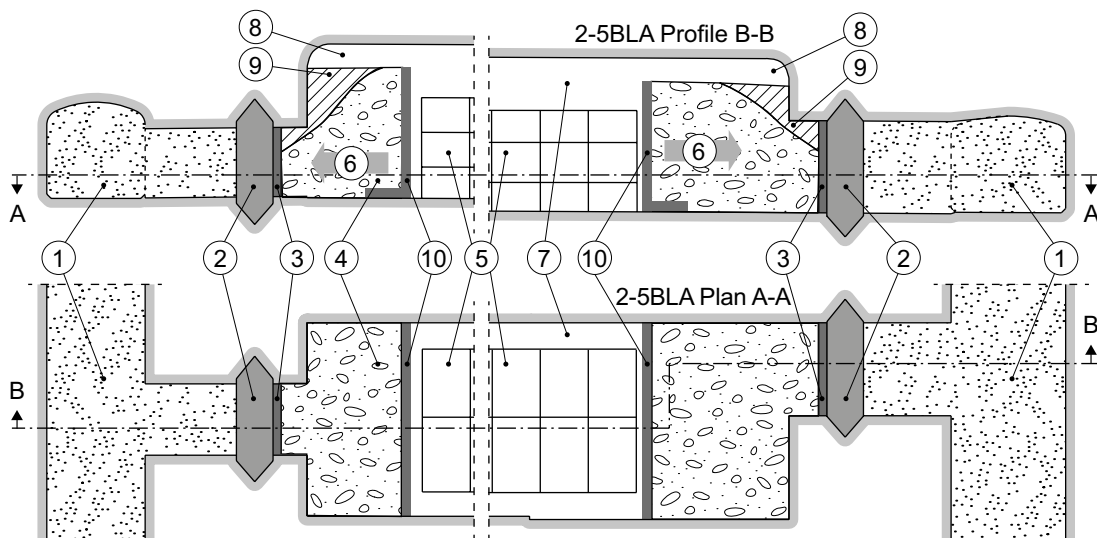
Schematic profile and plan of 2-5BLA after closure. Key to numbering: 1) Bentonite 2) Mechanical plug of concrete 3) Constraining wall and concrete form 4) Macadam 5) Waste 6) Working direction for backfilling of waste vault 7) Open vault 8) Gap at roof 9) Concrete 10) Retaining wall.
